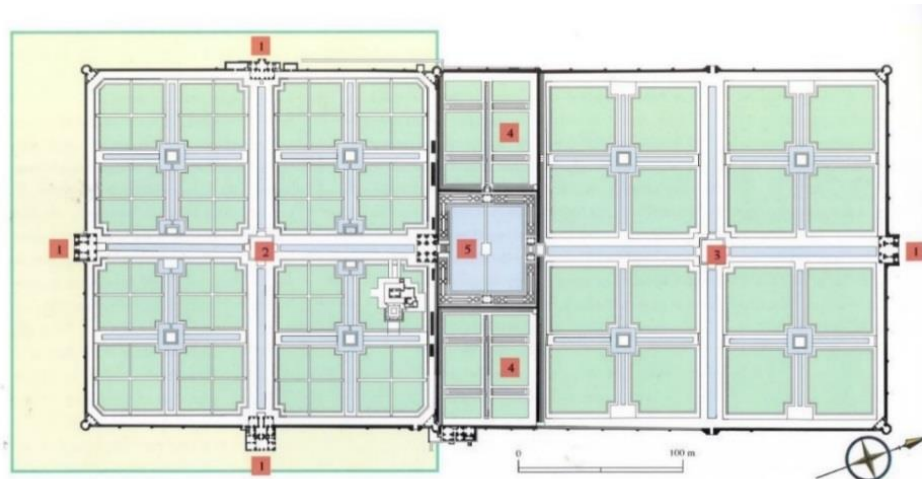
Plan of the Shalimar Gardens in Lahore; Heaven on Earth (Stierlin 2002: 174)
